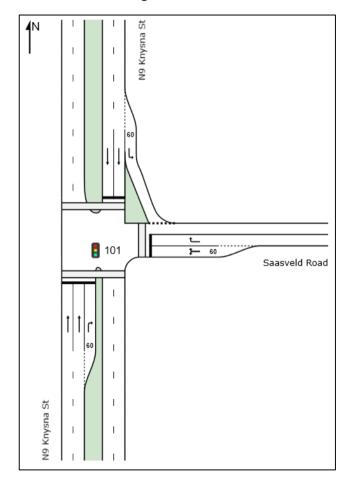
Layout: N9 Knysna Street & Saasveld Road
